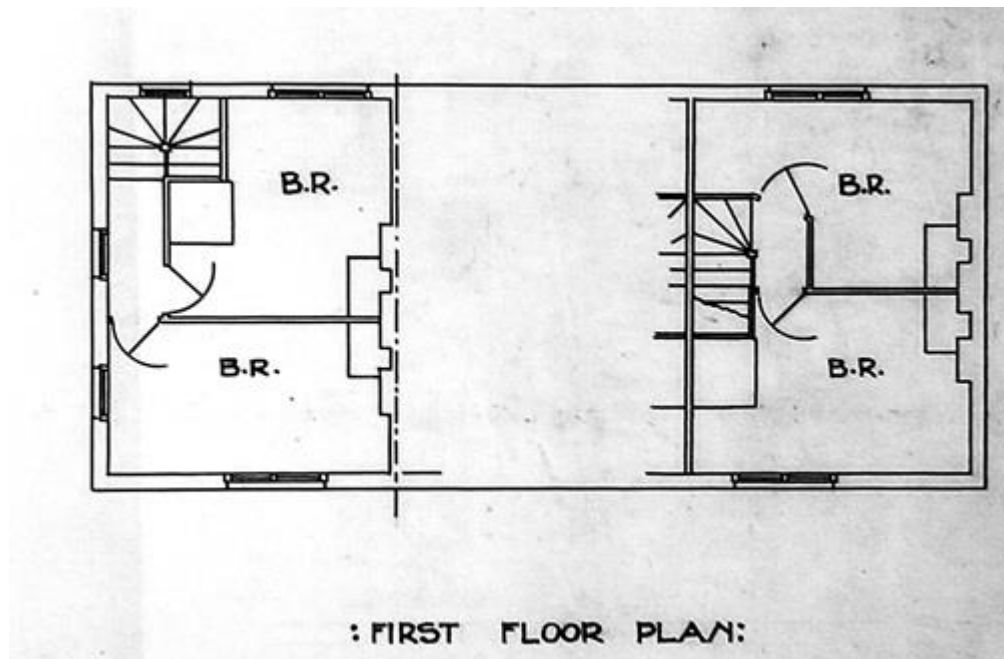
1st floor plan, St Lawrence Cottages (LMA ref: LCC/AR/HS/03/059)
